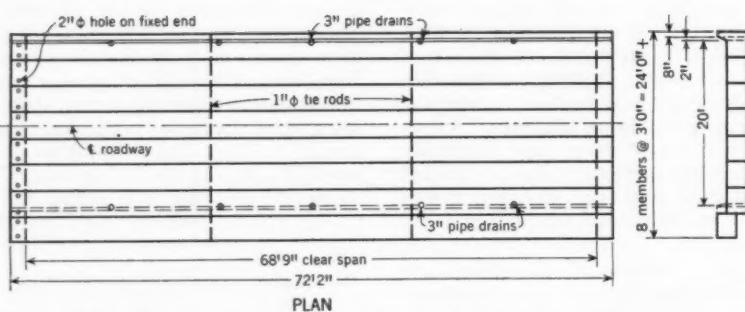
Eight hollow precast pretensioned beams, tied together transversely, constitute complete floor system.
